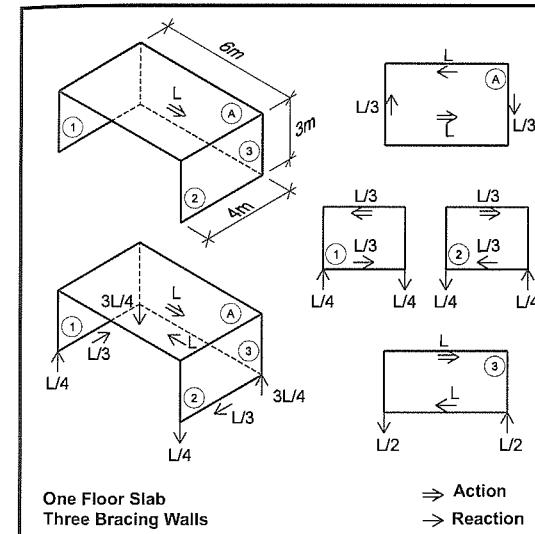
Example Of Action And Reaction Forces Due To Horizontal Load In A Determinate Slab-Wall System
